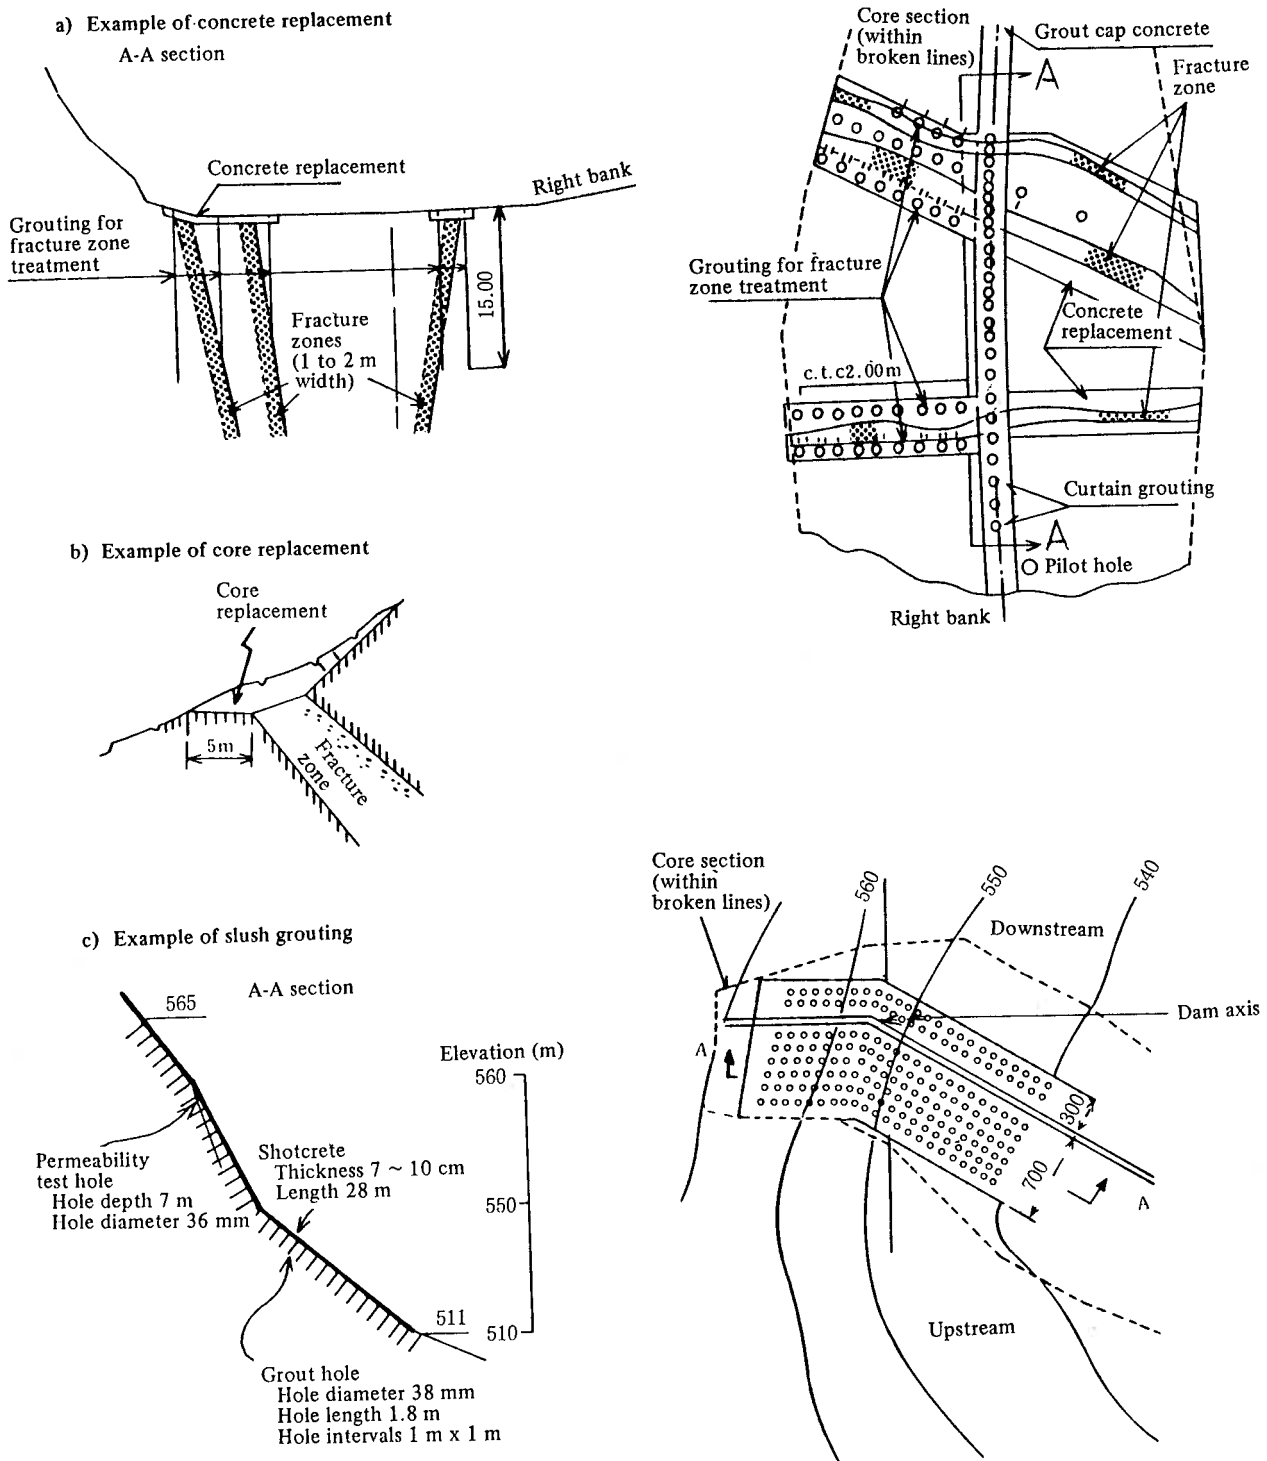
Replacement by concrete or core materials, and slush grouting at the superficial area of fracture zones
